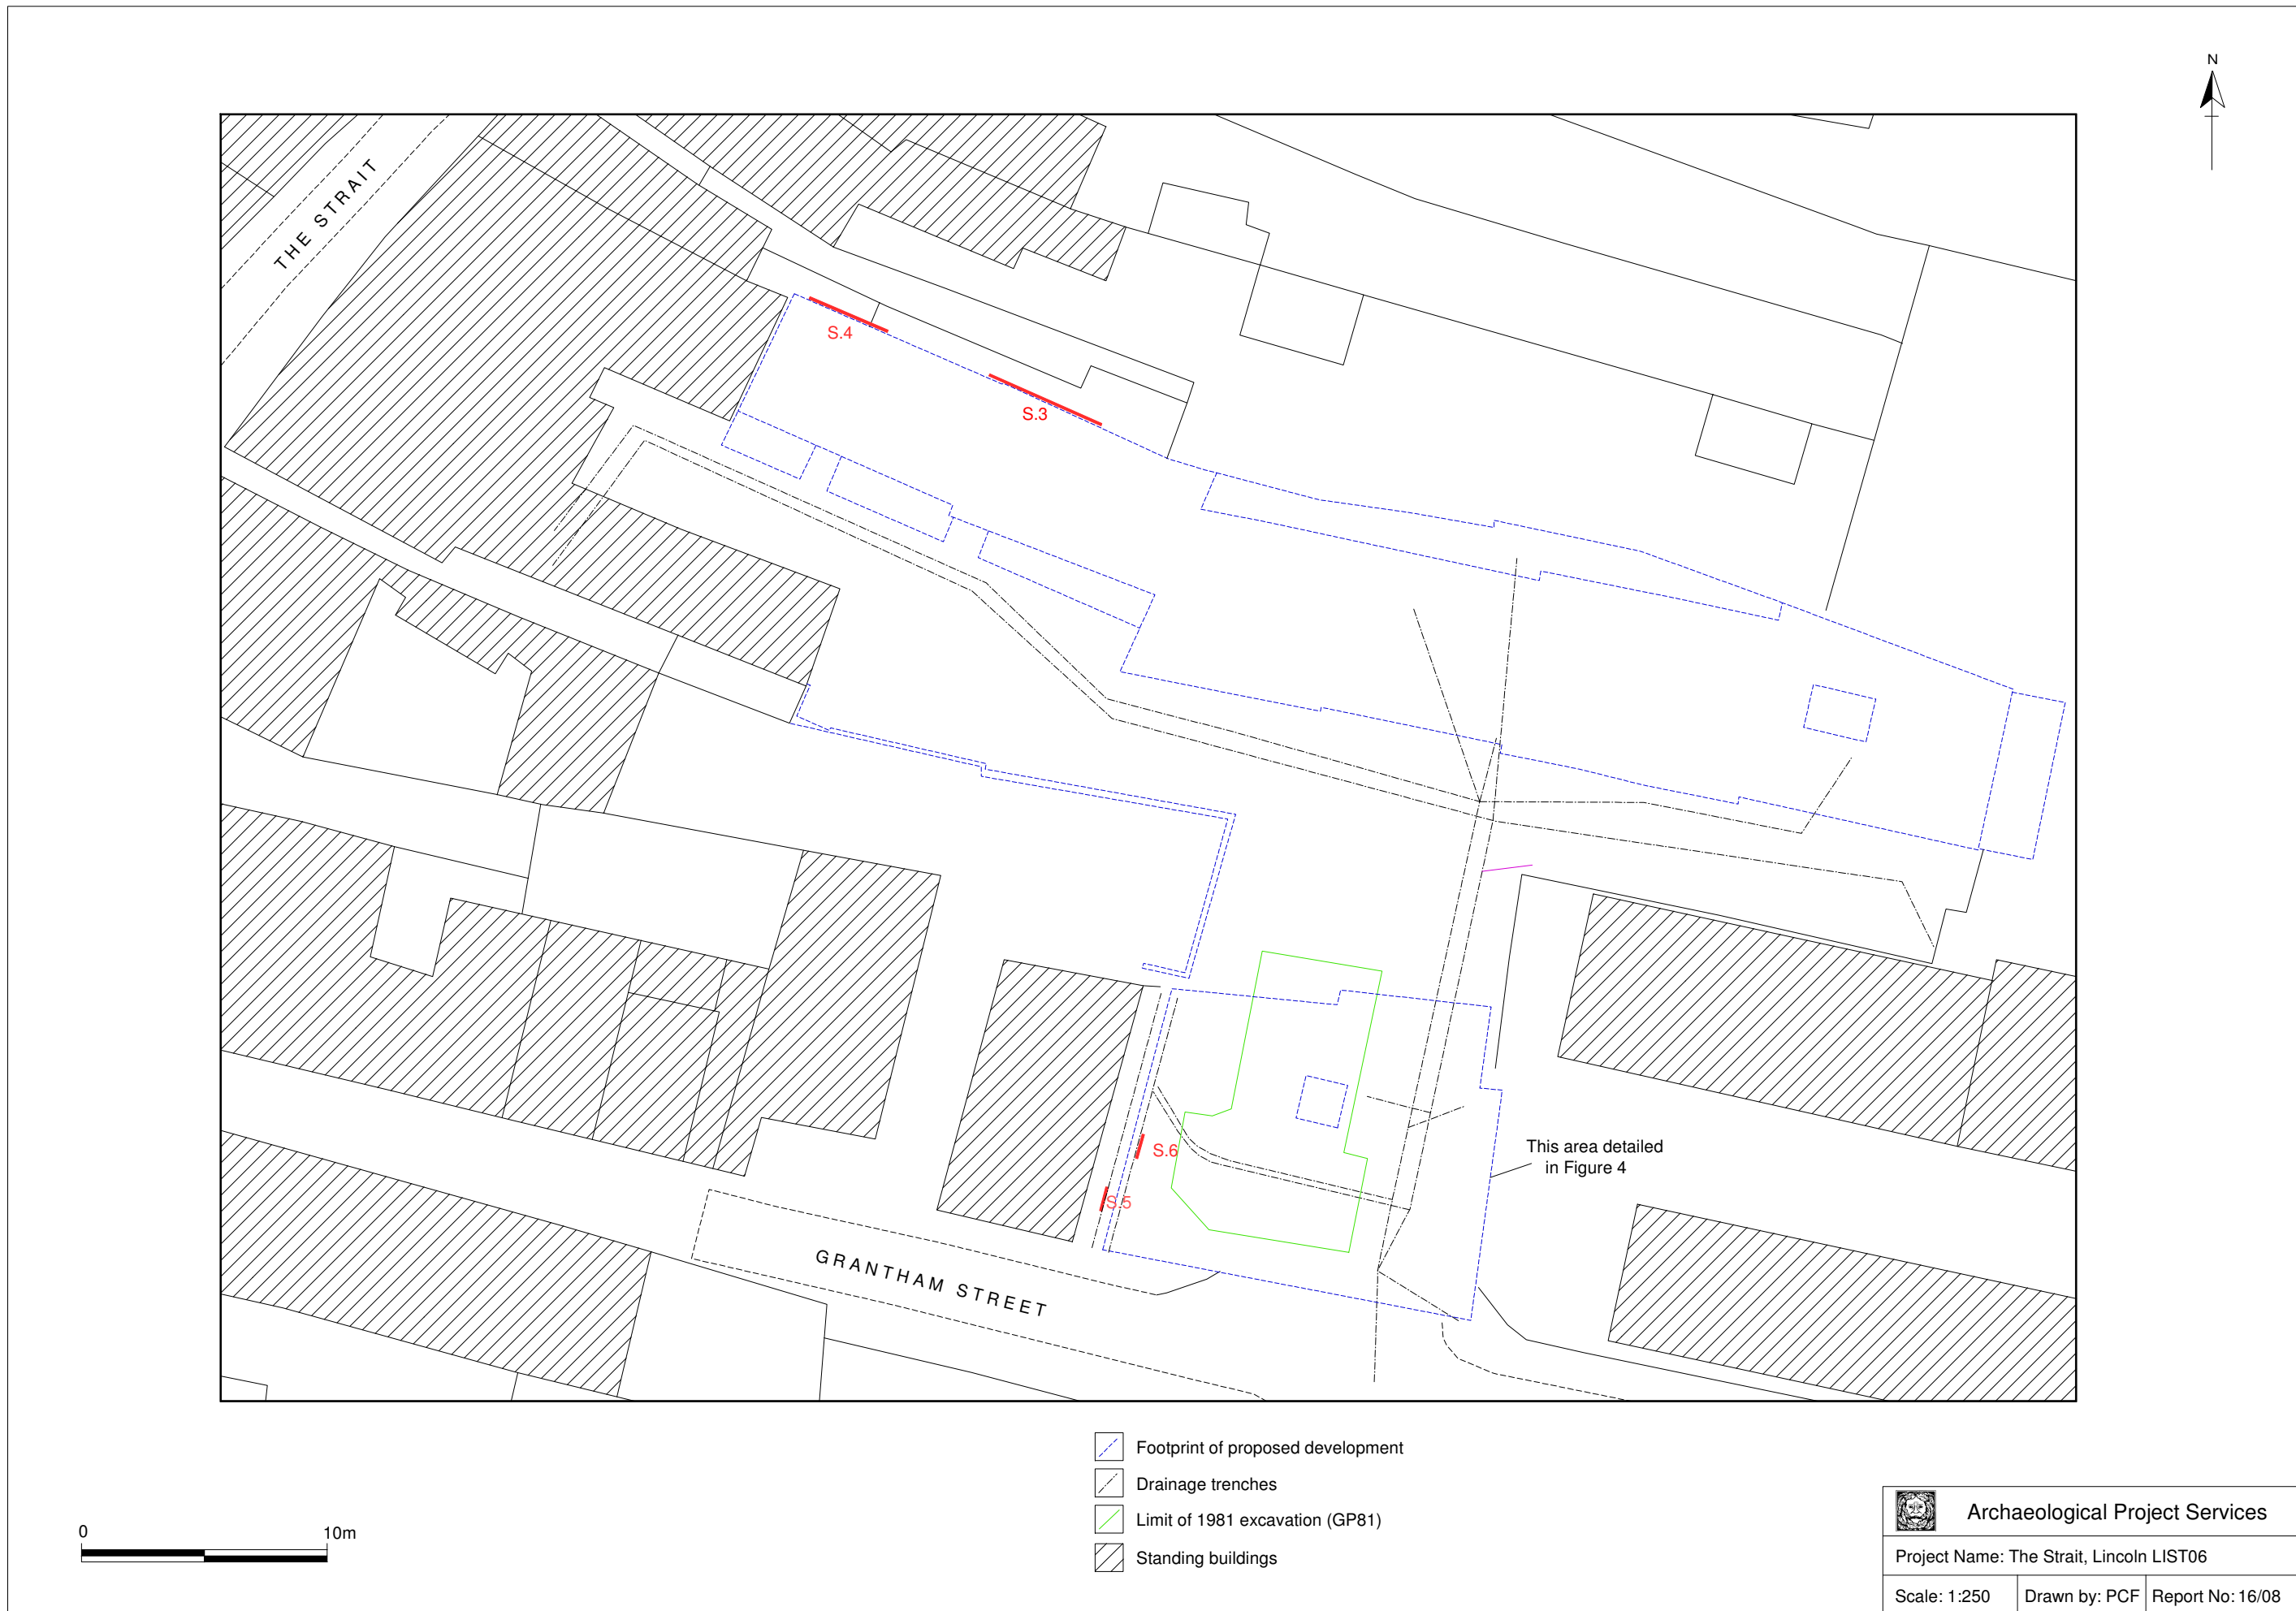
Plan of the development showing location of drawn sections during drainage work
